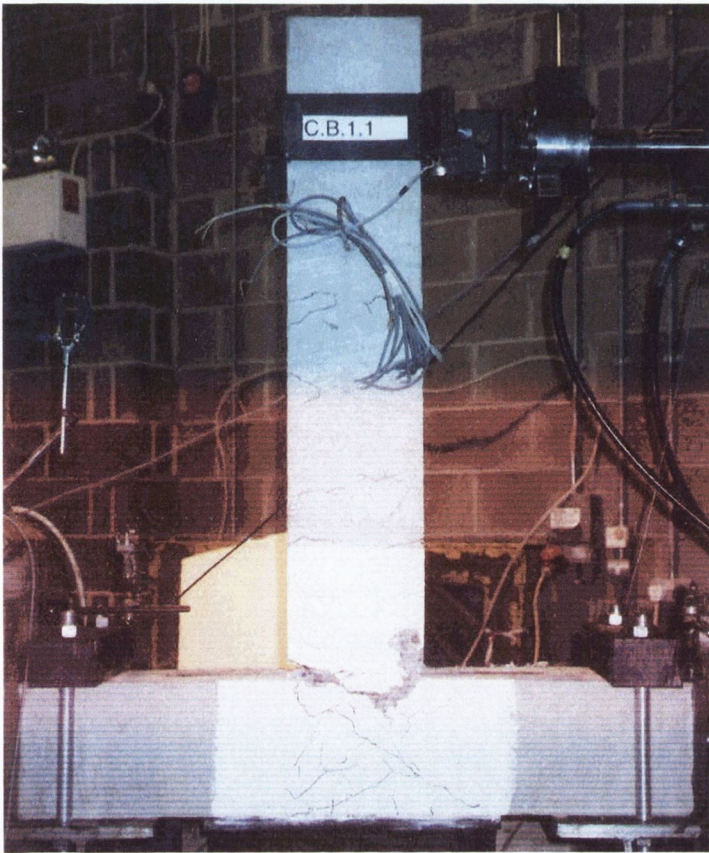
illustrates the specimens after failure. Damage elsewhere in the specimens was limited, as is clear from Figures 4.17(a) and 4.17(c). In the joint region, a criss-cross pattern of shear cracks developed in all of the specimens. However, with the exception of specimen C1.3/145 (Figure 4.17(d)), this cracking was not severe enough to initiate cover spall of the concrete. In specimen C1.3/145 the cover concrete did spall from the joint region, exposing the transverse steel. In the beams, hairline cracks developed at the beam corners, usually forming at the position of a link.
